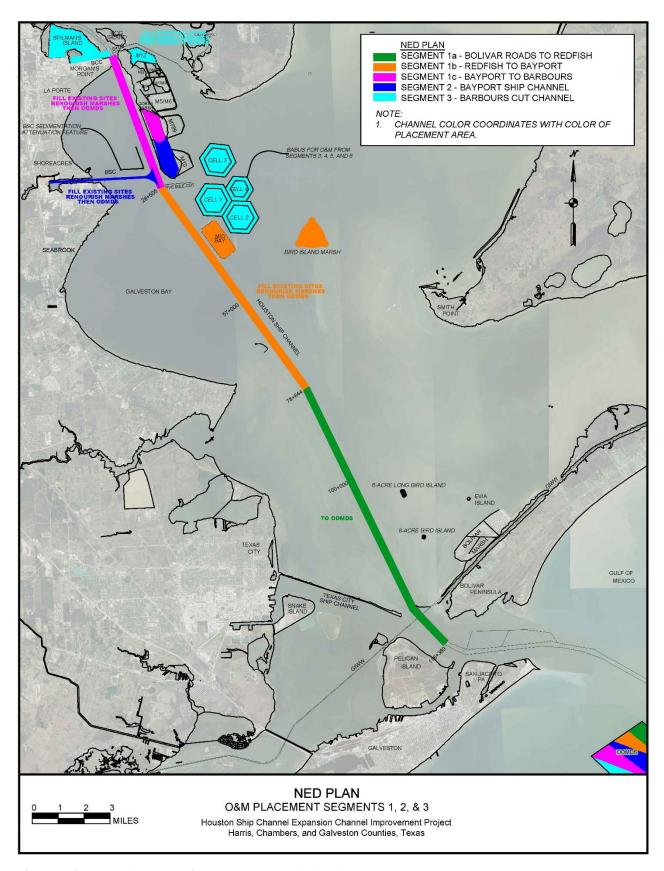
NED Plan O&M Placement Segments 1, 2 & 3
